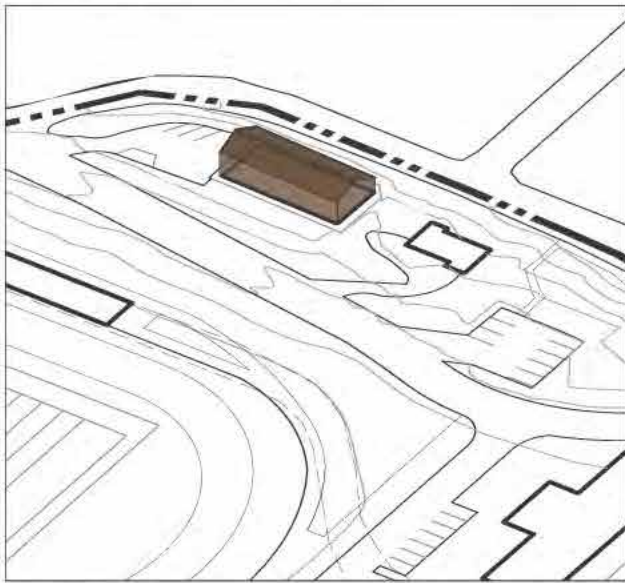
Axonometric and Site Plan of renovated Campus Police building
